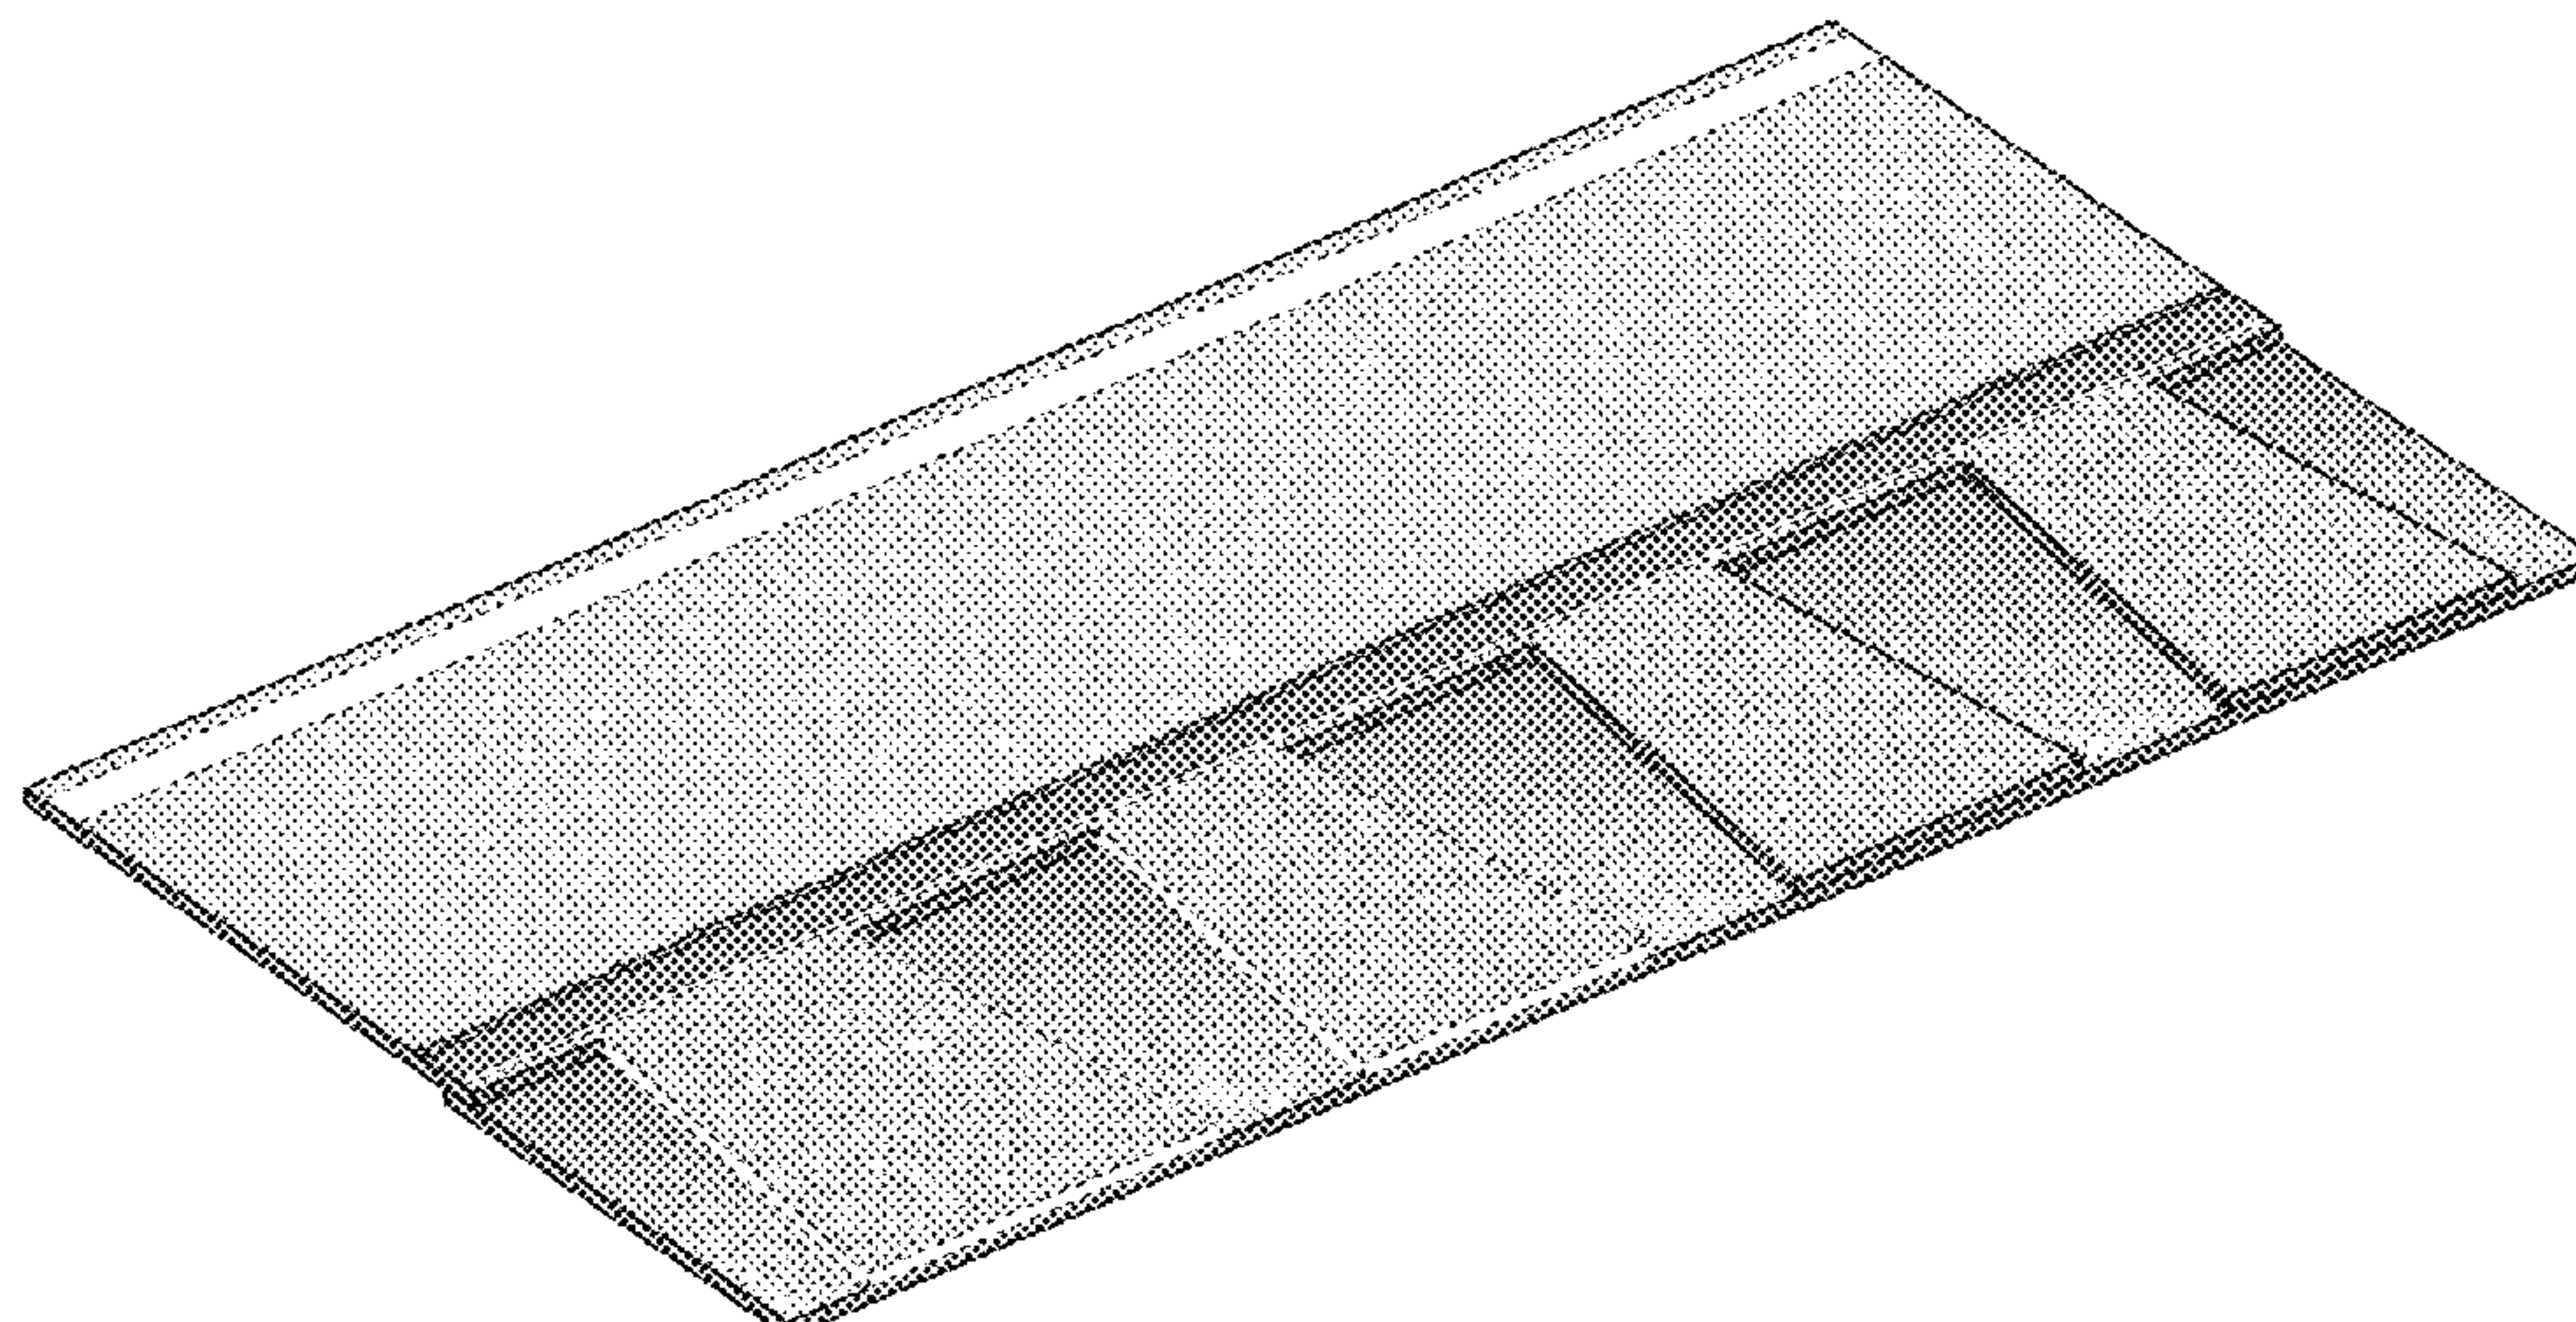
is a bottom view of the first embodiment of the shingle shown in FIG. 1; and,
